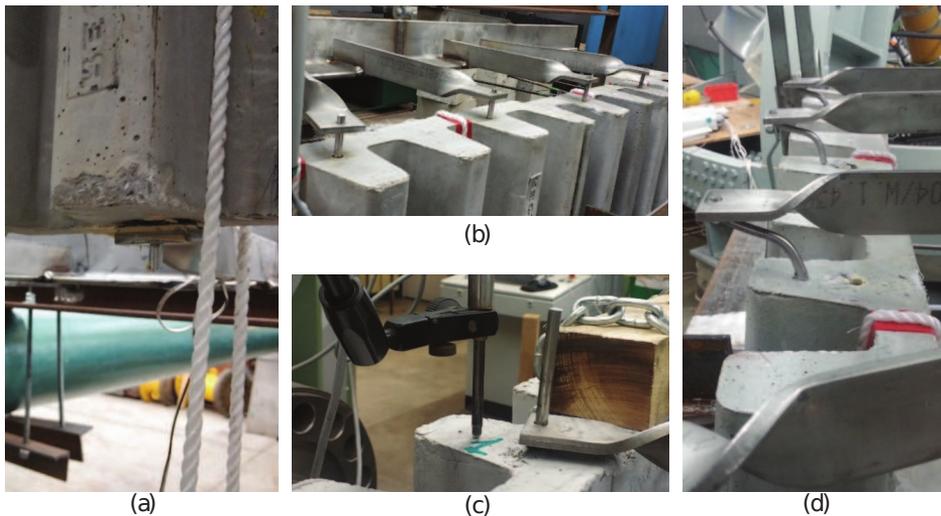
Failure modes of the curtain wall components: fracture of mortar where the panel rests on the anchor (a), steel bolts forced out of the concrete panels (b), bolt forced out of the flat bar anchor (c), bolts forced out and bent thereafter (d)
